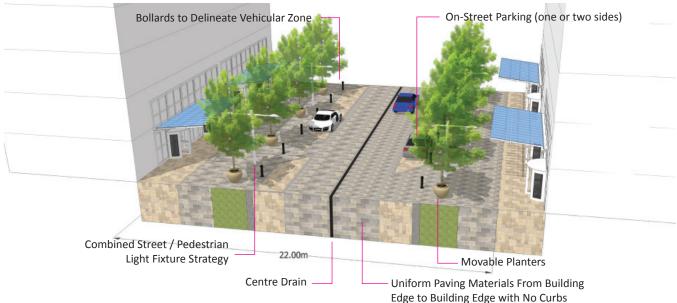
Flexible Street with Movable Planters (Typical Mid-block)
